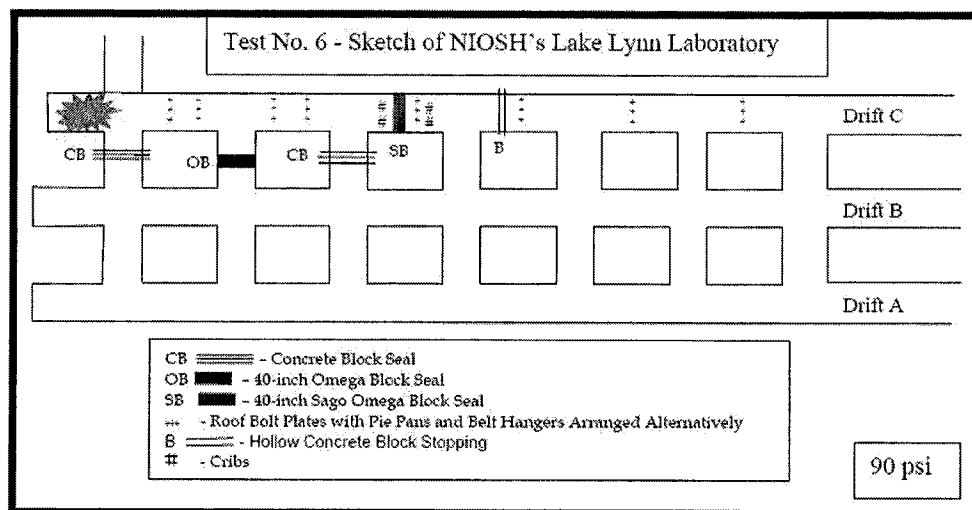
Sketch of layout for Test No. 6 at the LLEM (from Ref 7)
